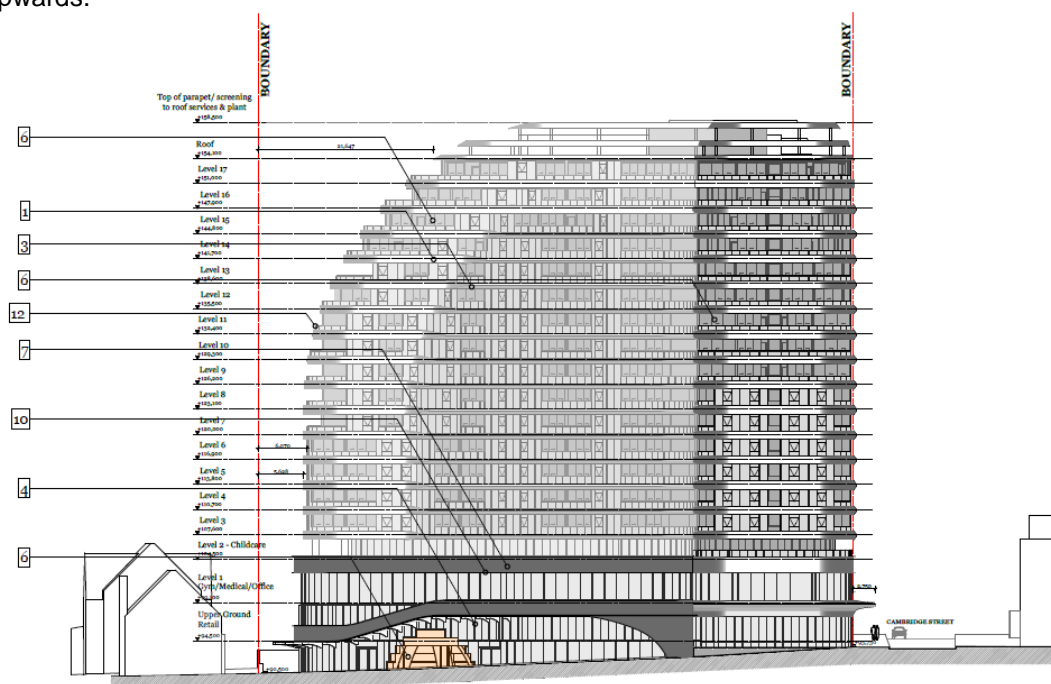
Building A east elevation (Station Street) showing the transition to the southern boundary
